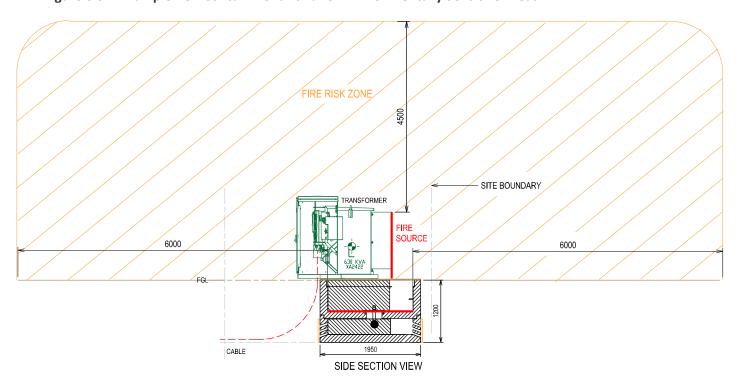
Example – Precast Concrete Oil Containment Bund
